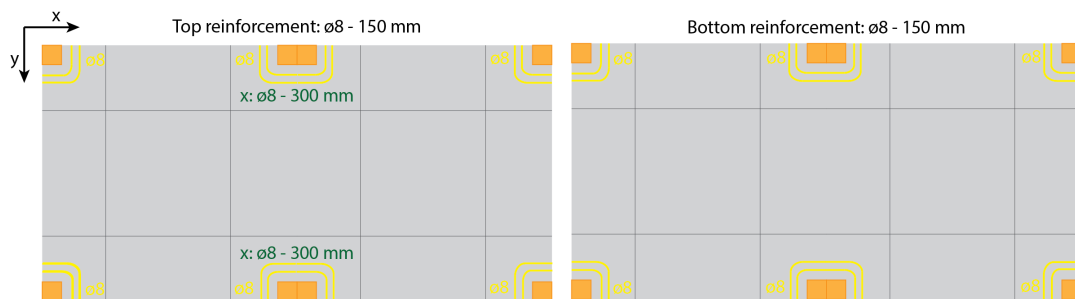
Reinforcement for two-way concrete floor. Black = main reinforcement, green = additional reinforcement, yellow = shear reinforcement
